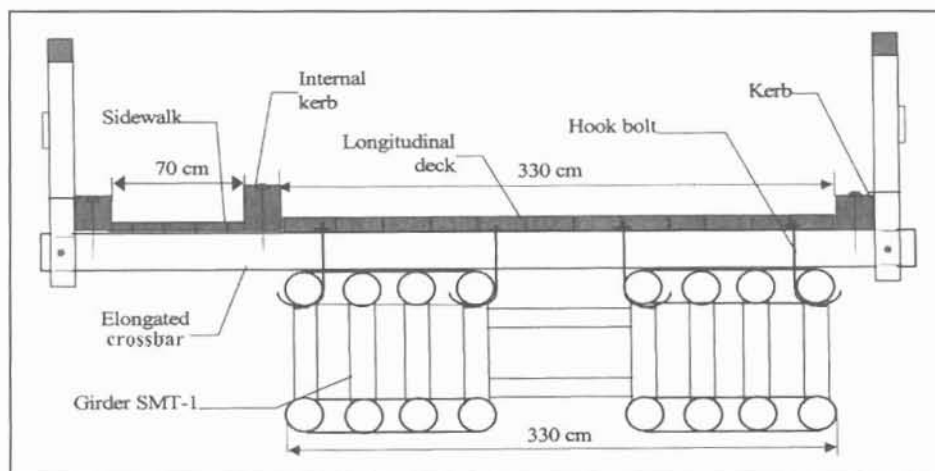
Cross section of an SMT bridge span. The bridge is built longitudinally with a wooden deck on crossbars.
